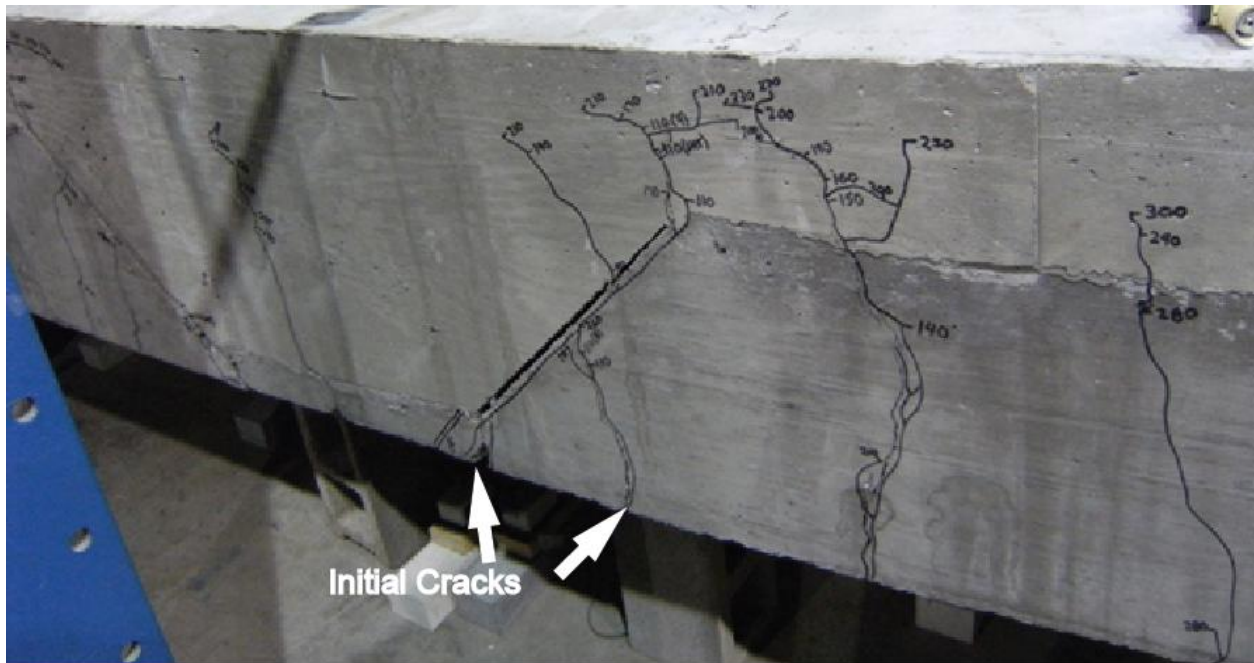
Cracks on Embedded Plate Tapered Specimen (photo)
